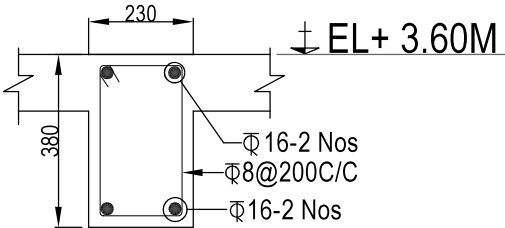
A @ SUPPORT (SCALE - 1:15)
